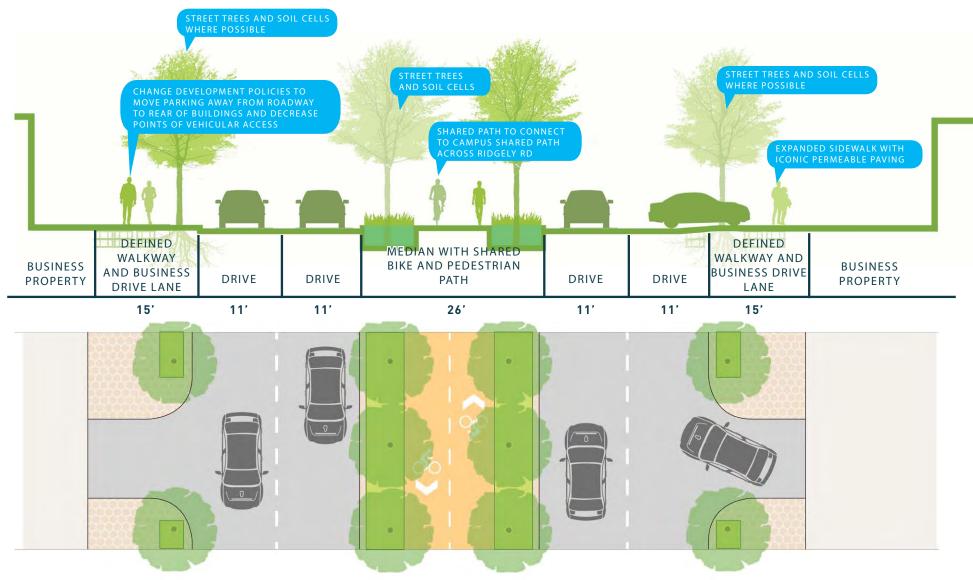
A proposed street design of International Boulevard between Tyler St. and Polk St.
